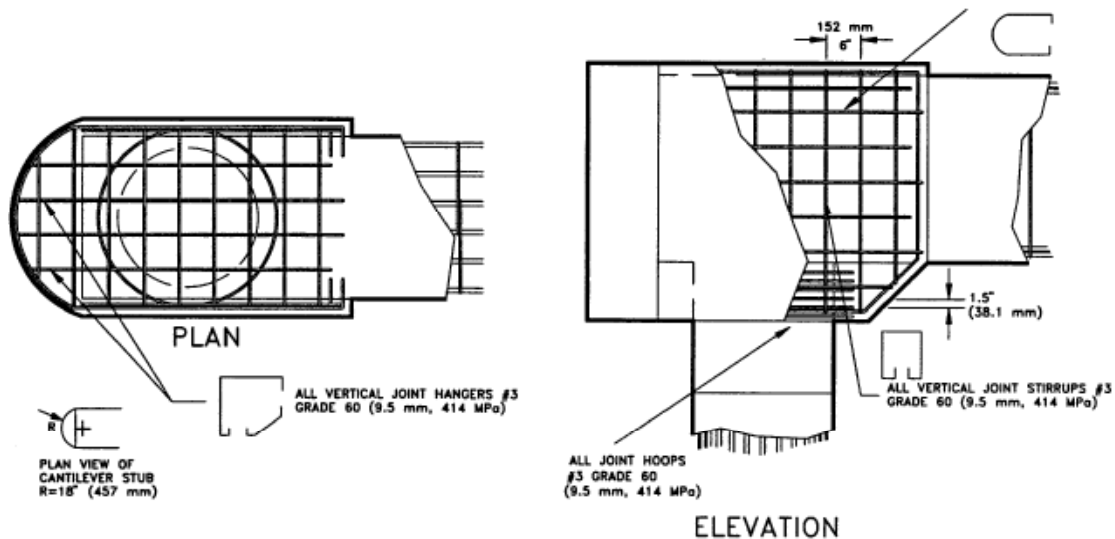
Joint Reinforcement Details of the Retrofitted Specimen (Adapted from Ingham et al., 1994b)
